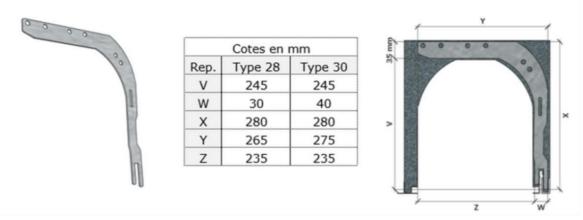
Galvanized steel reinforcement for reinforced boxes
